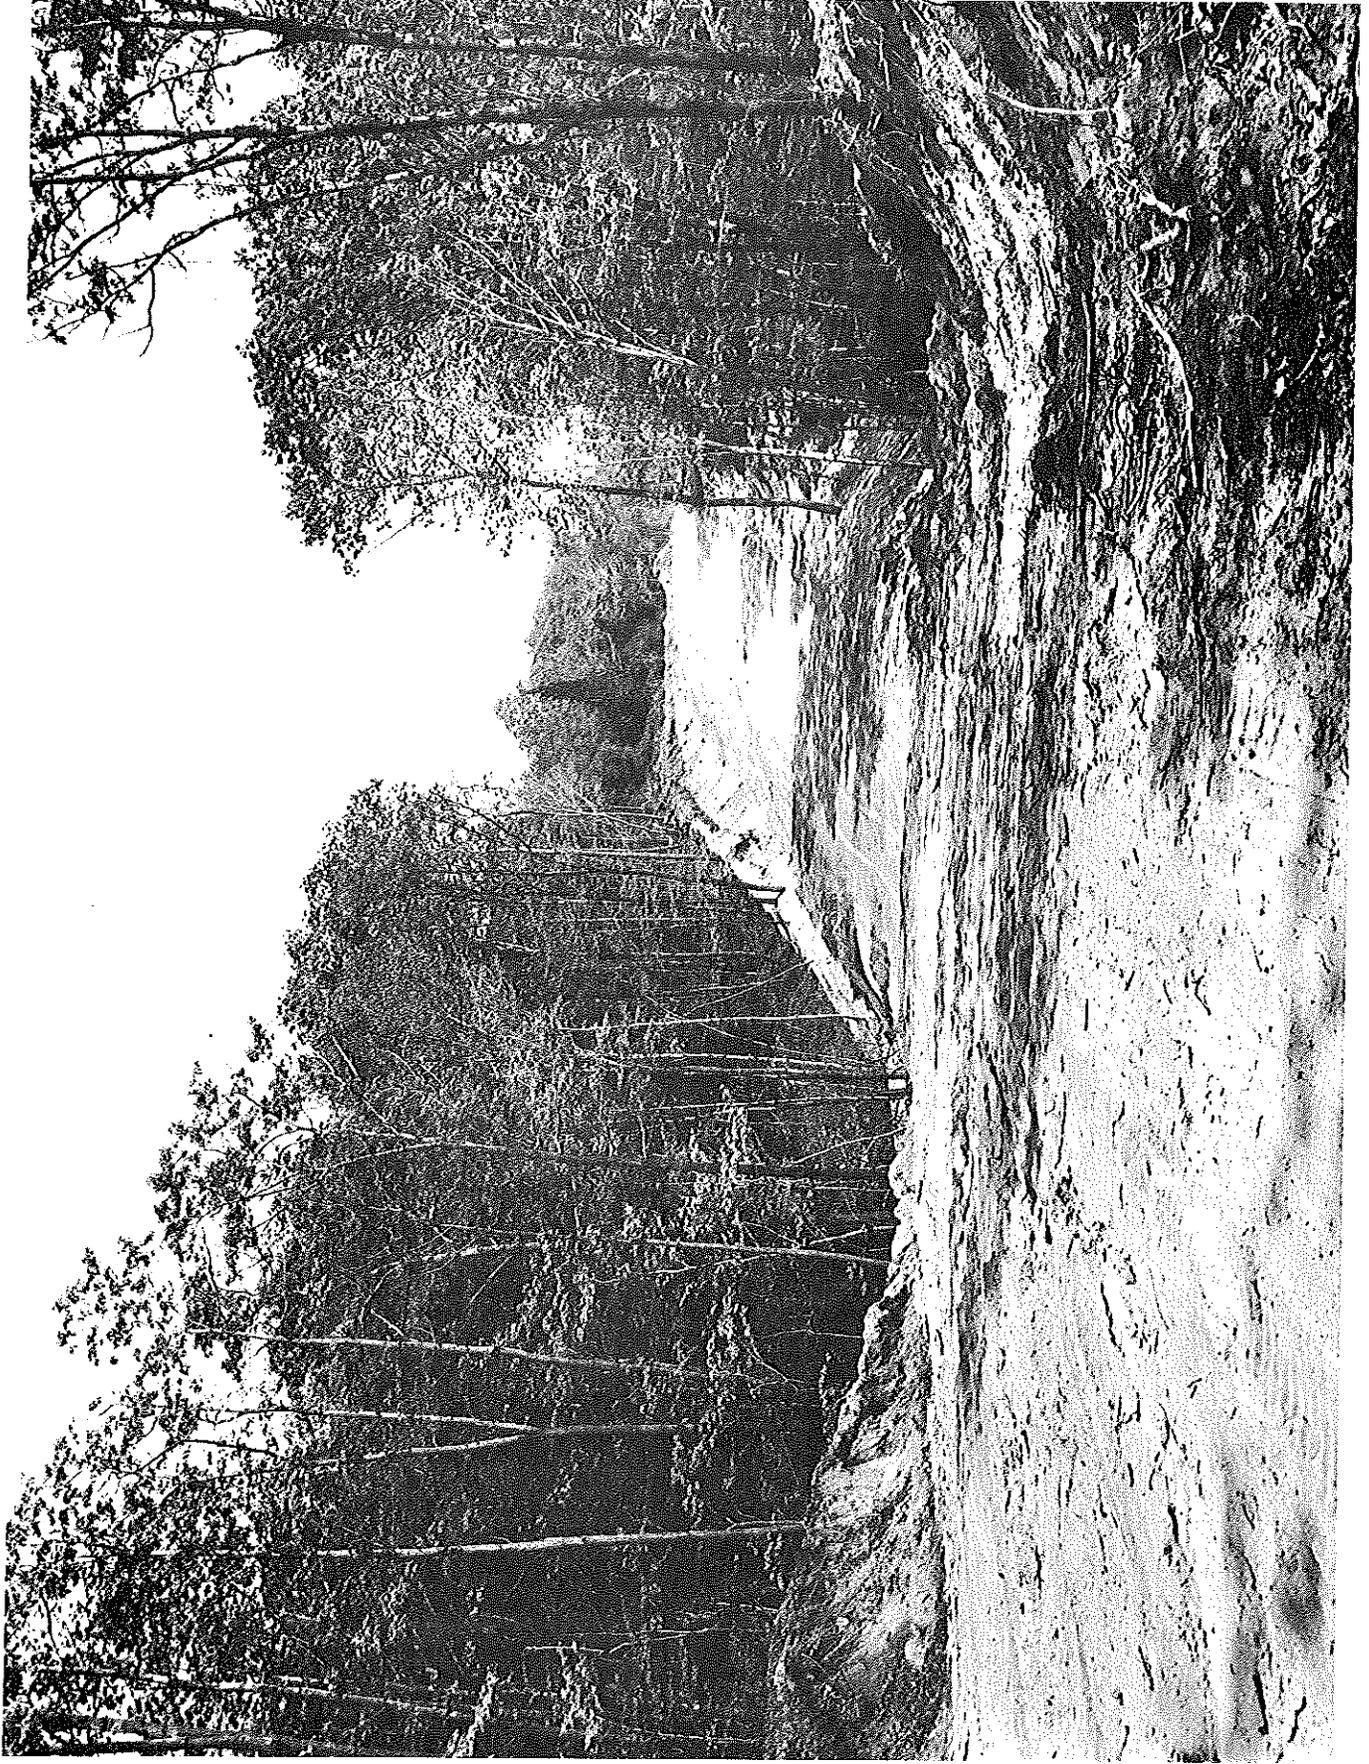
Completed right-of-way for 138-kV underground cable on Long Island.
